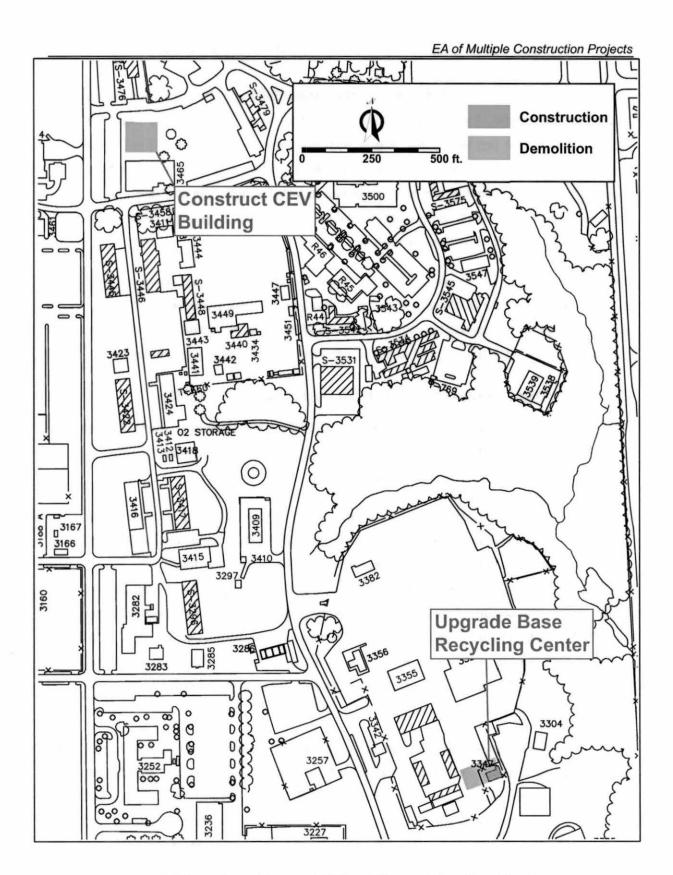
Locations of Proposed CEV Building and Base Recycling Center
